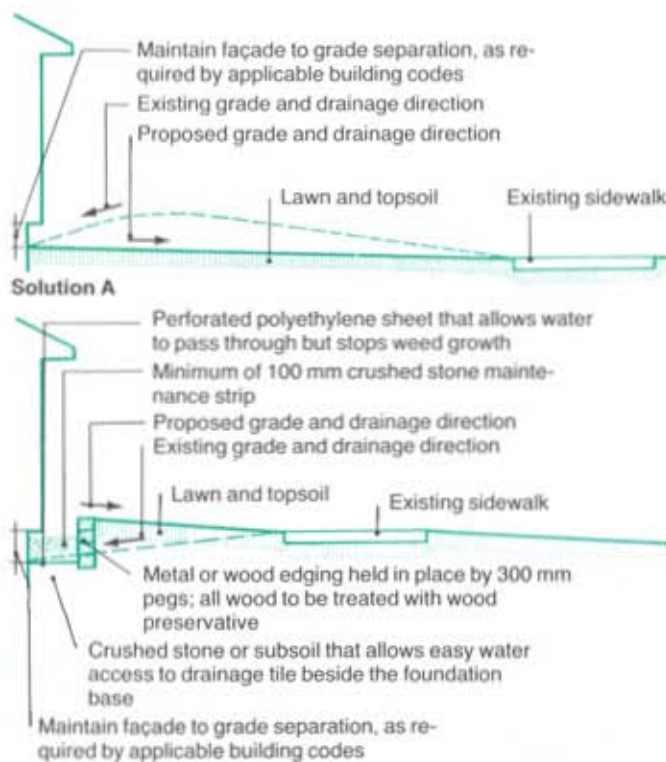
Draining surface water away from buildings is one of the most important functions of grading. Solution A is appropriate when the surrounding site can be re-graded; Solution B should be adopted when the existing site layout and elevations force the corrective action to take place next to the building.
